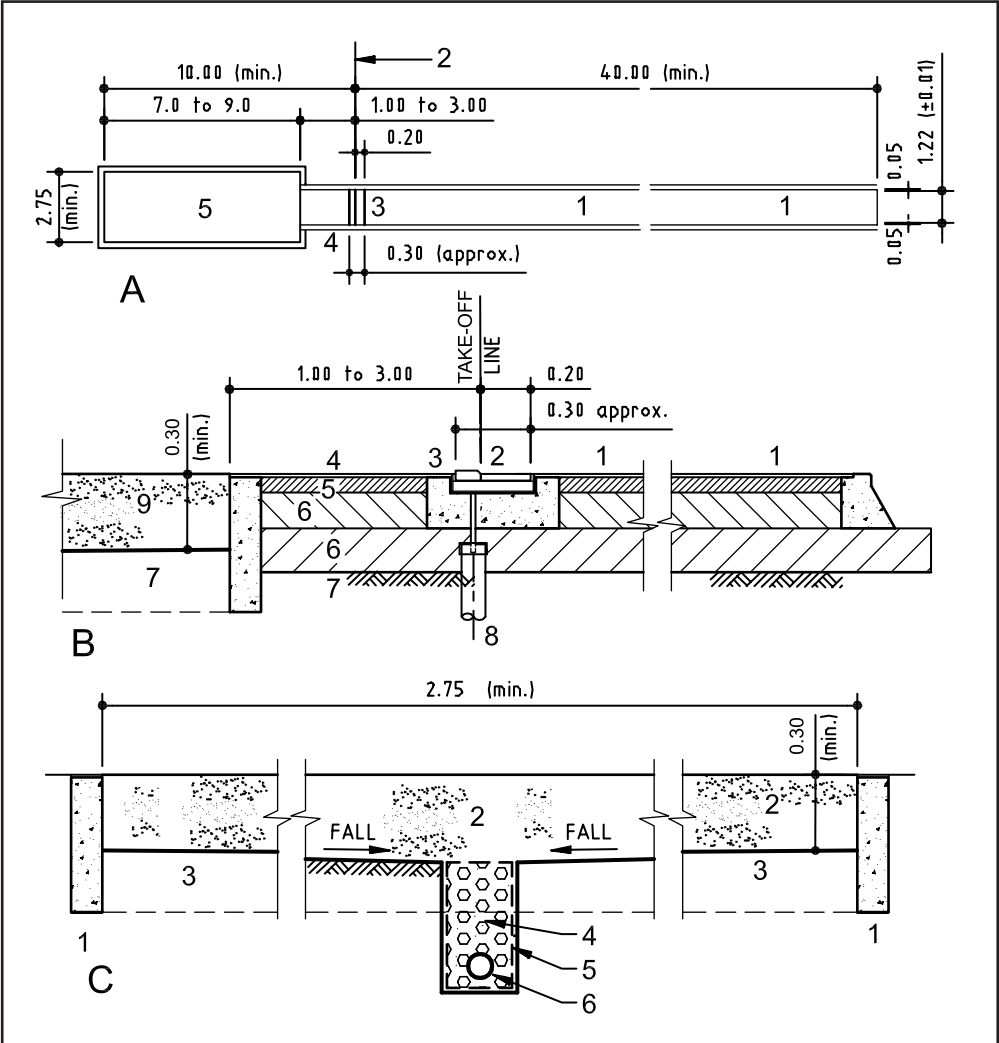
Facility for the Long Jump (Dimensions in m)
